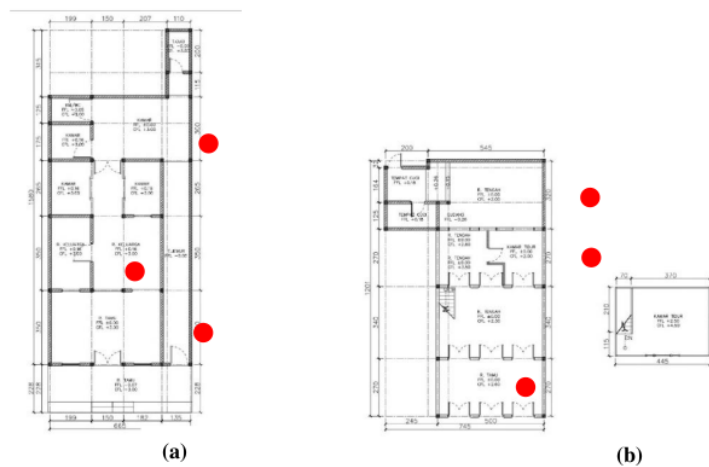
Semarang vernacular house plan and roof shape. (a) Original Semarang vernacular house plan. (b) Modified Semarang vernacular house plan
